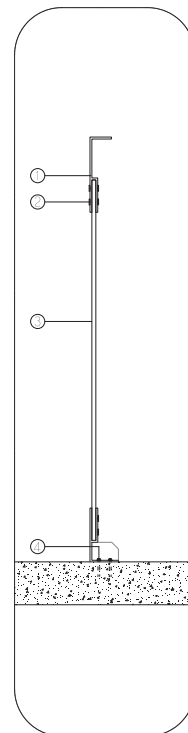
WALKWAY CONCRETE EDGE DETAIL
